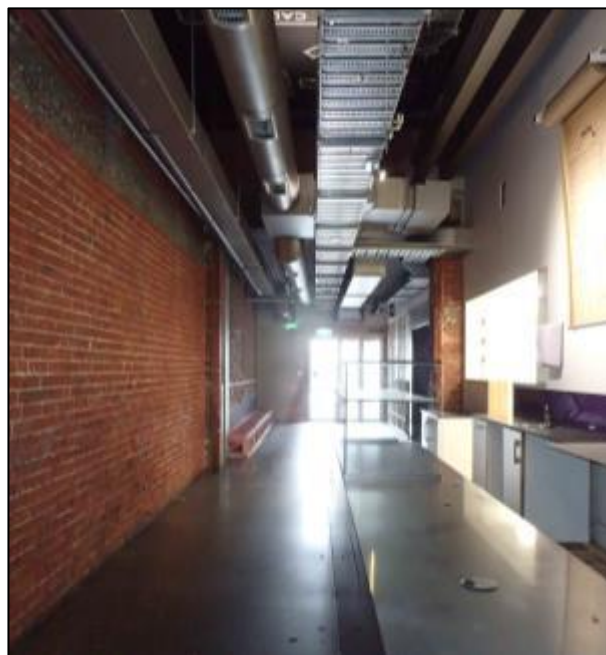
Photograph looking west on the ground floor of the Cadbury World building. Note the brick remnant of a north-south wall either side of the room. This is likely the original walls of the granary and malt floor. The opening that they form was present by 1922 and may be associated with the earliest outlay of the building however this is unclear.
